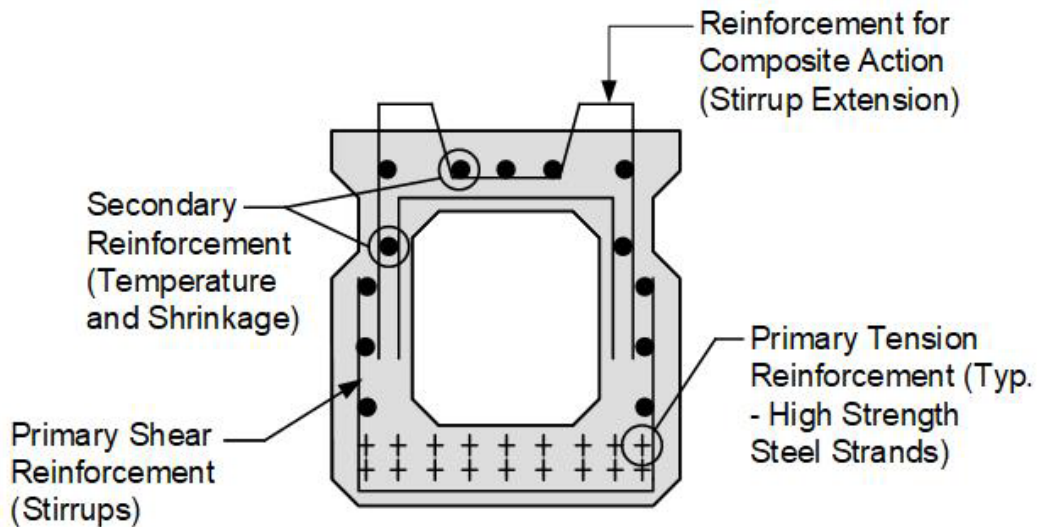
Steel Reinforcement of a Prestressed Box Beam
